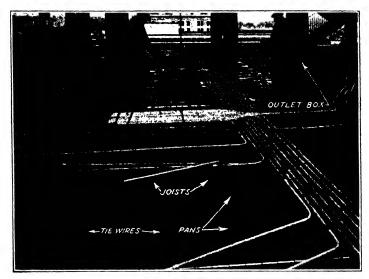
Installation of Thin-Wall Conduit before the Concrete Floor Is Poured in Erection of an Office Building Courtesy of Steel and Tubes, Inc., Cleveland, Ohio
